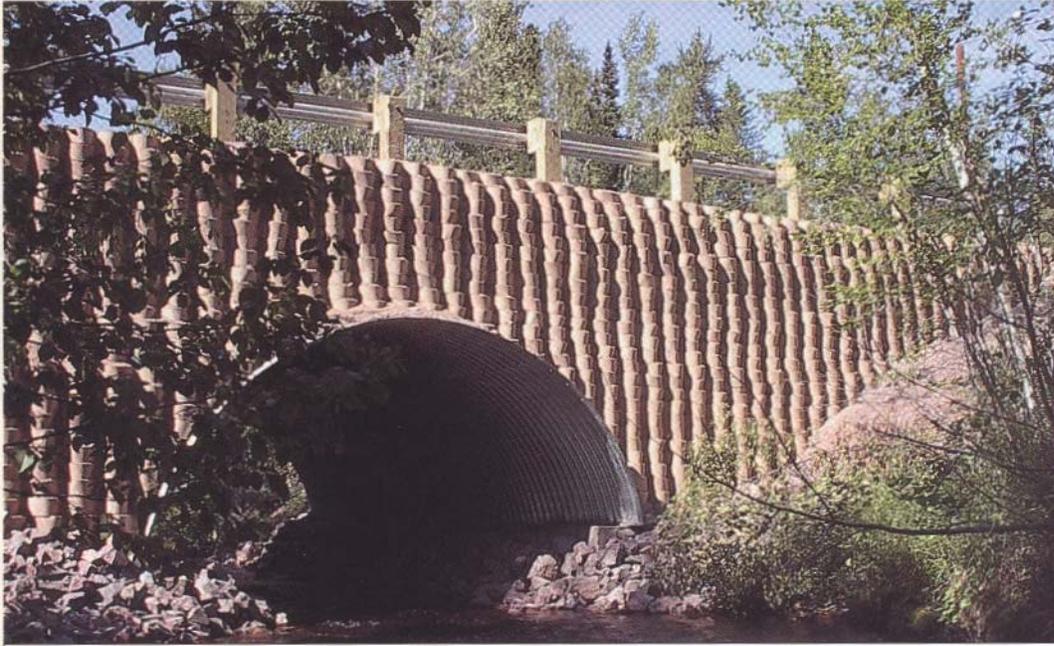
A view of the finished bridge looking upstream. The footings and toe of the wall were riprapped to protect them from erosion.
